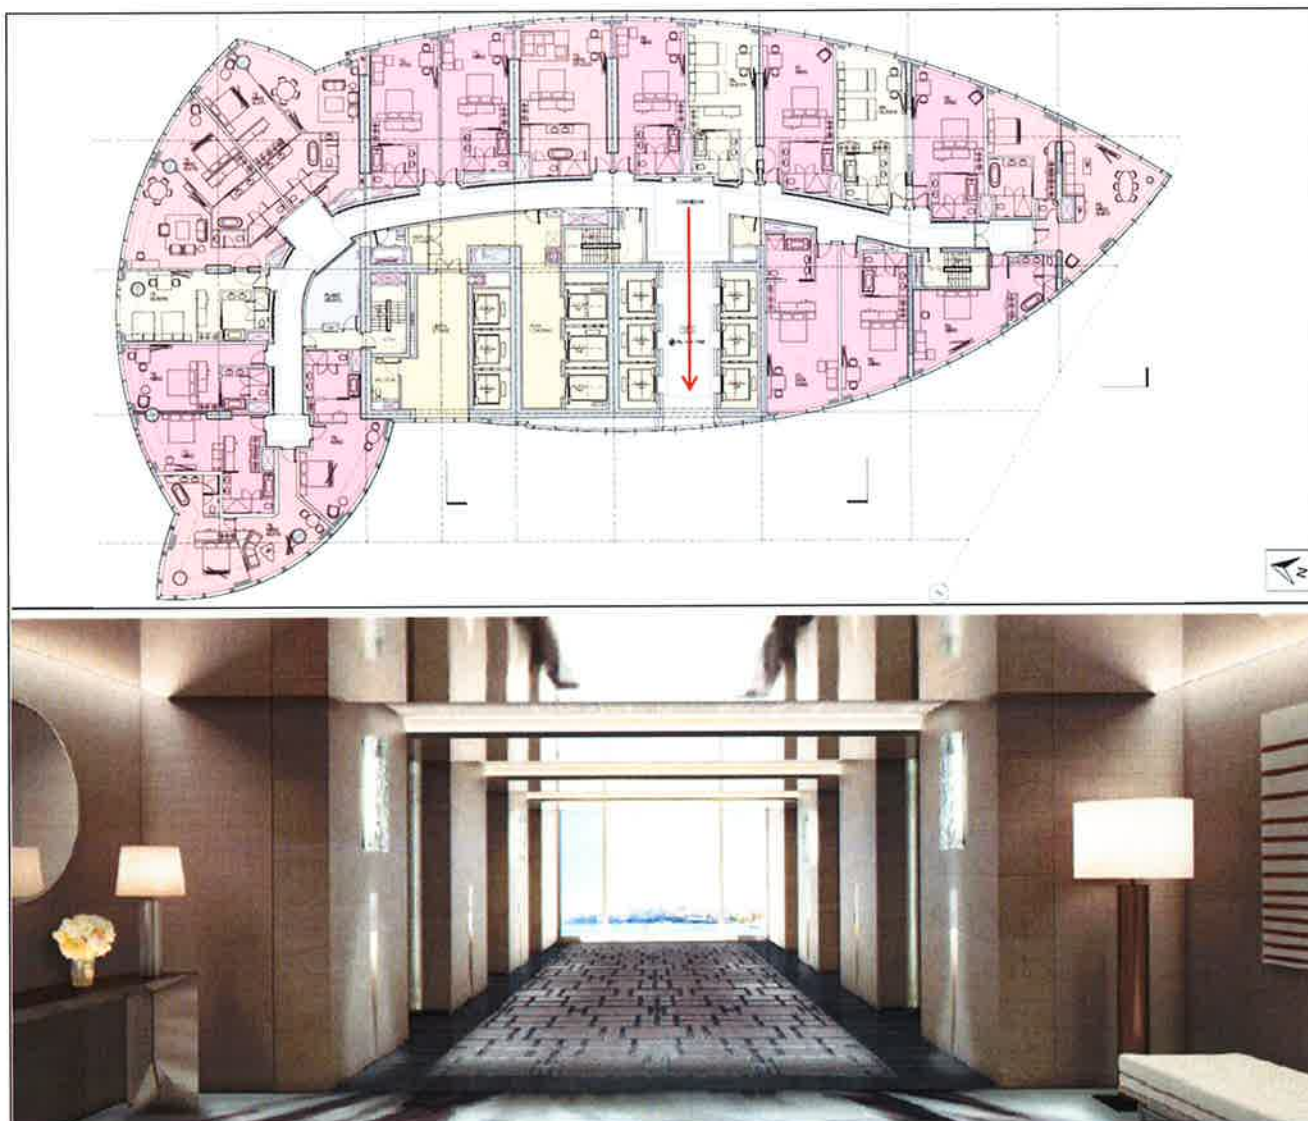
Indicative hotel floor plan (top) and hotel lift and corridor concept imagery (bottom)
